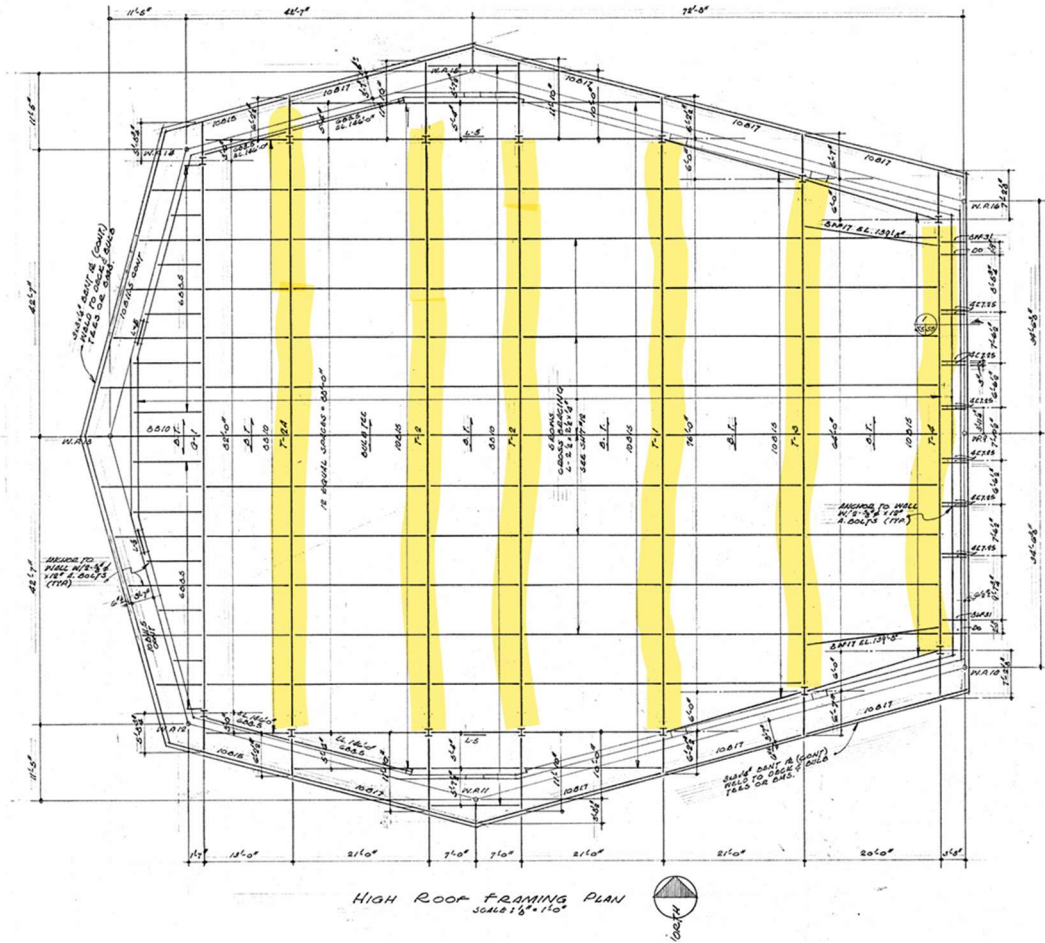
Roof 4 of the CFAC with Trusses Highlighted.
